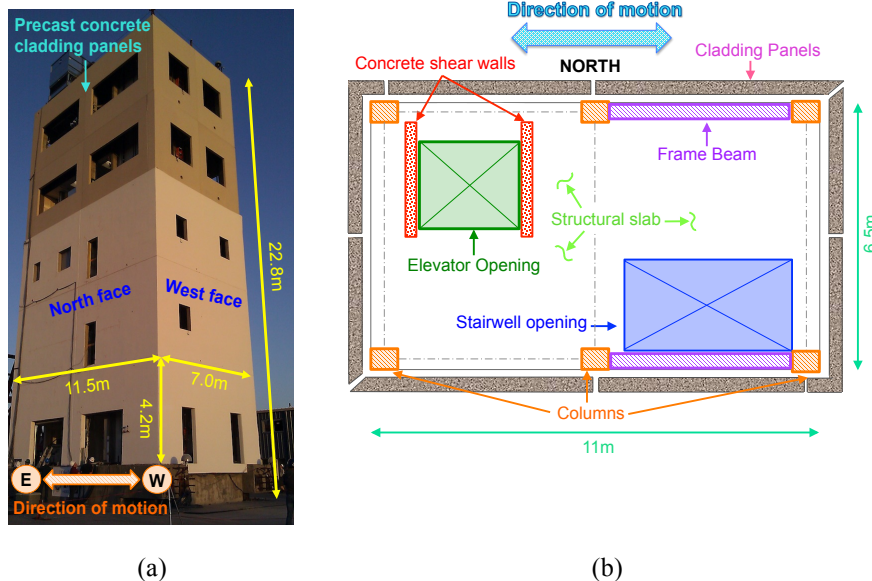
General views of the test building: (a) photograph of the North and West sides of the building and (b) plan view of a typical floor
